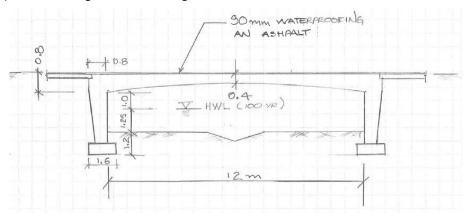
Conceptual Cross-Section for Structural Alternative 2B - North Structure
